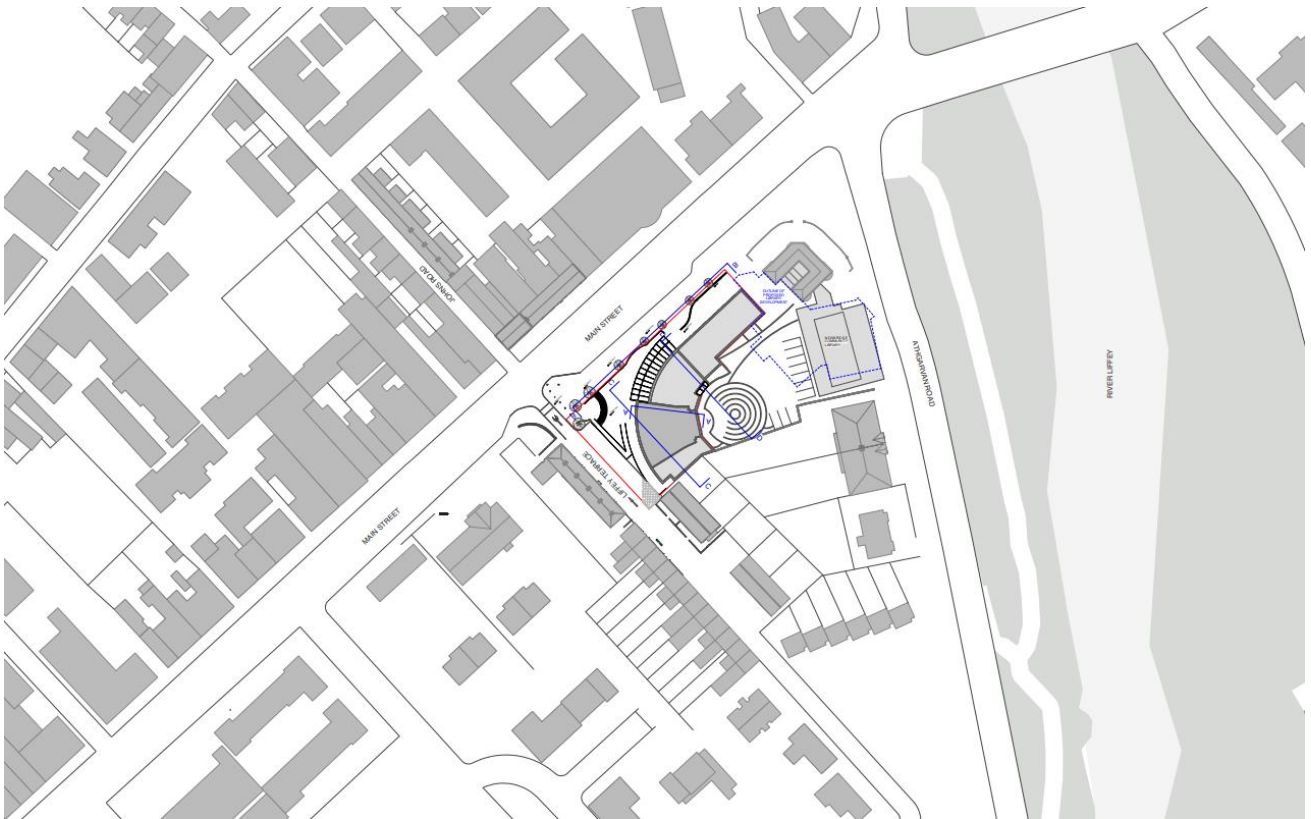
Site Location, Newbridge Main Street (Source: Studio Red Architects)
